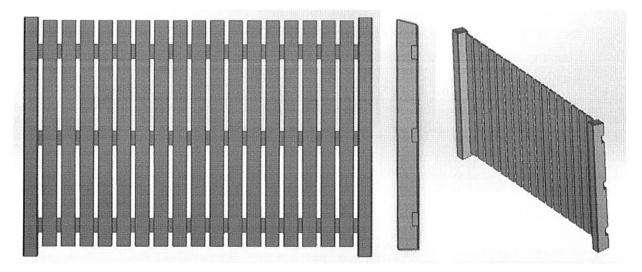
Fence section views, left to right: front (as viewed from outside the property), side profile, and isometric view showing post, rail, and picket configuration.
